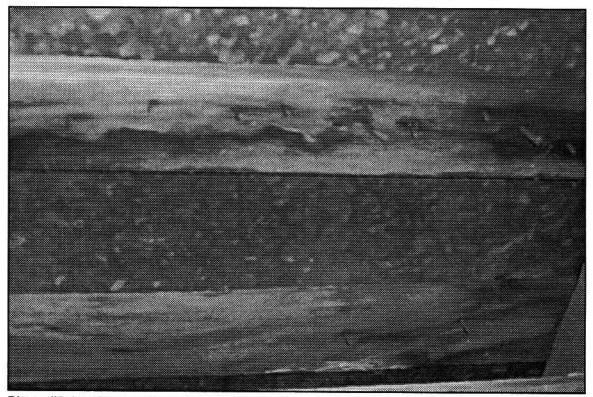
Interior at rear ell, note nails from older wood shingles protruding through roof boards.
